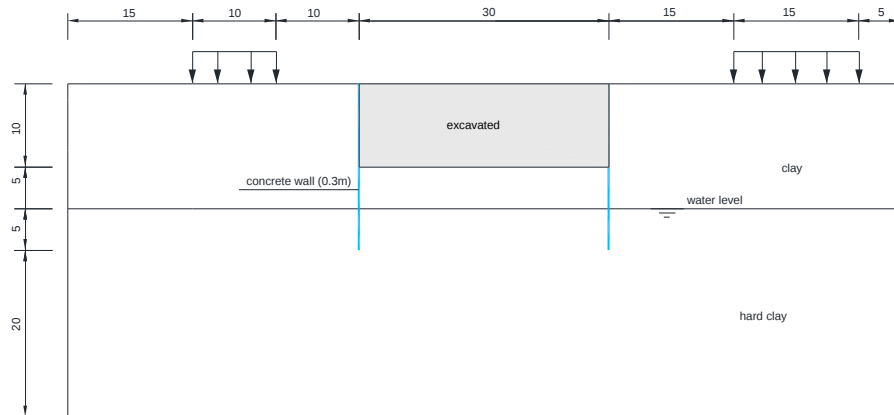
Geometry of excavation and strut supported retaining wall
